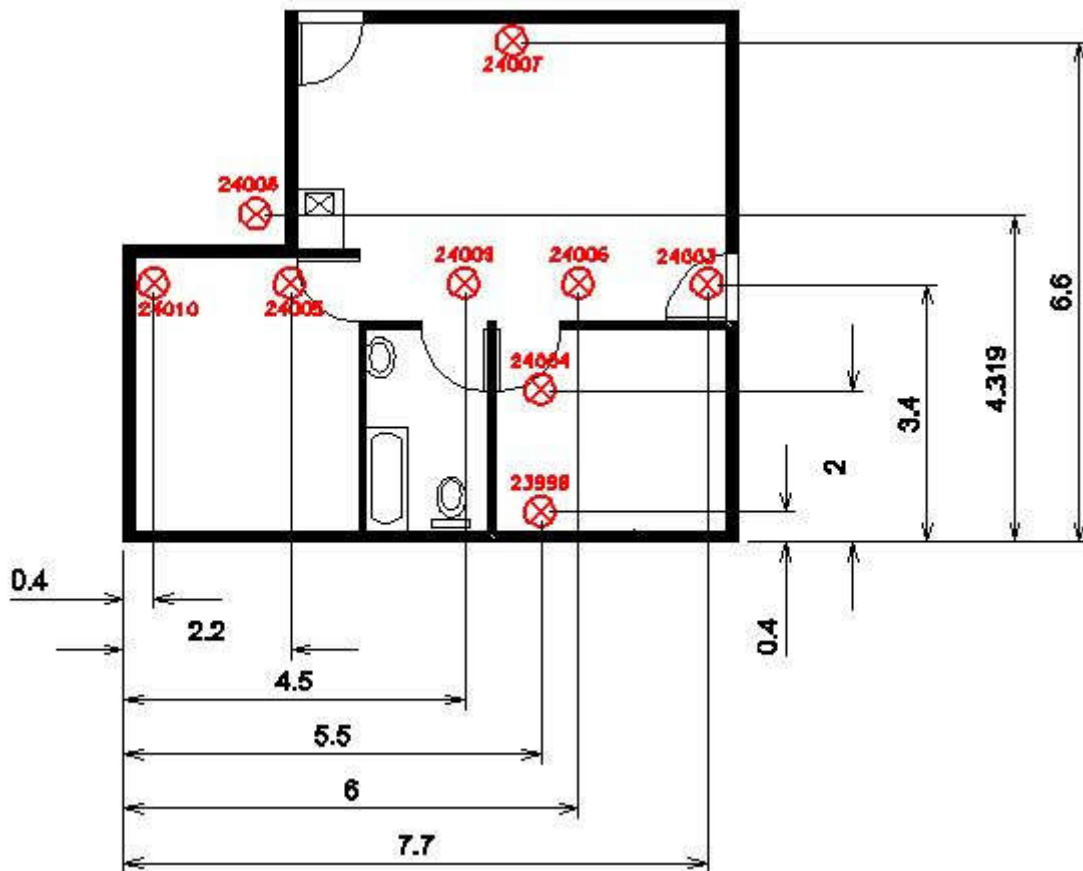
CLSM probe layout in raft foundation: dimensions meters
